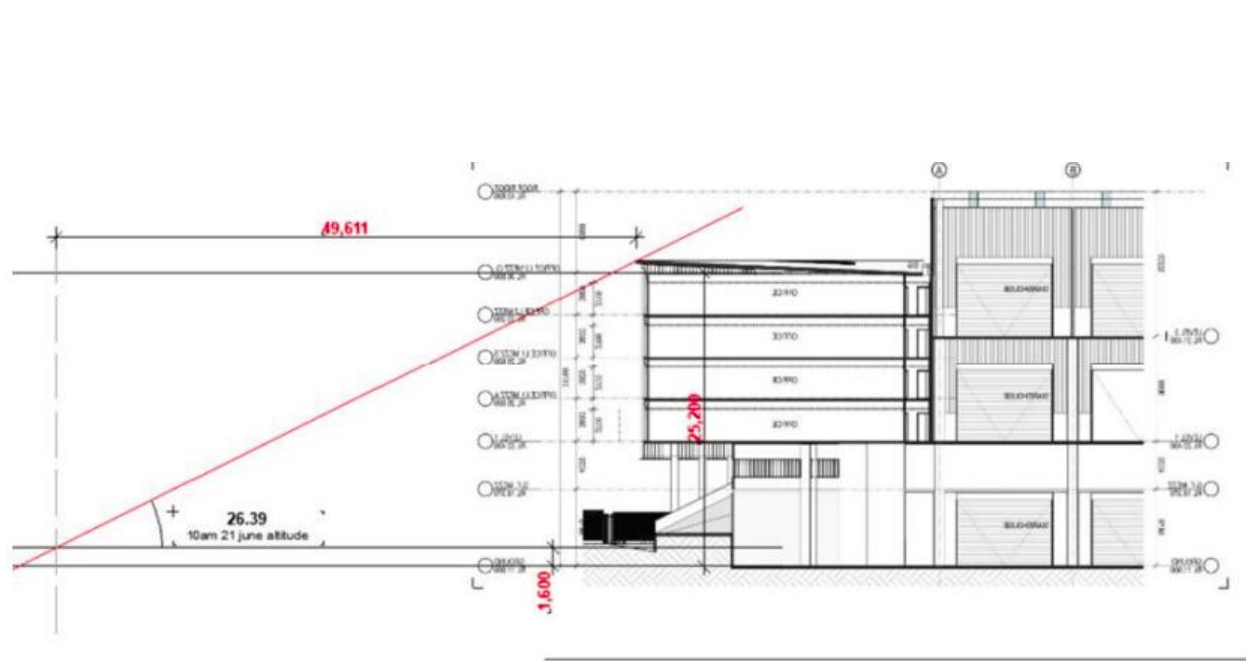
Office Sections - Extract from Office Section A of Appendix F Architectural Plans
